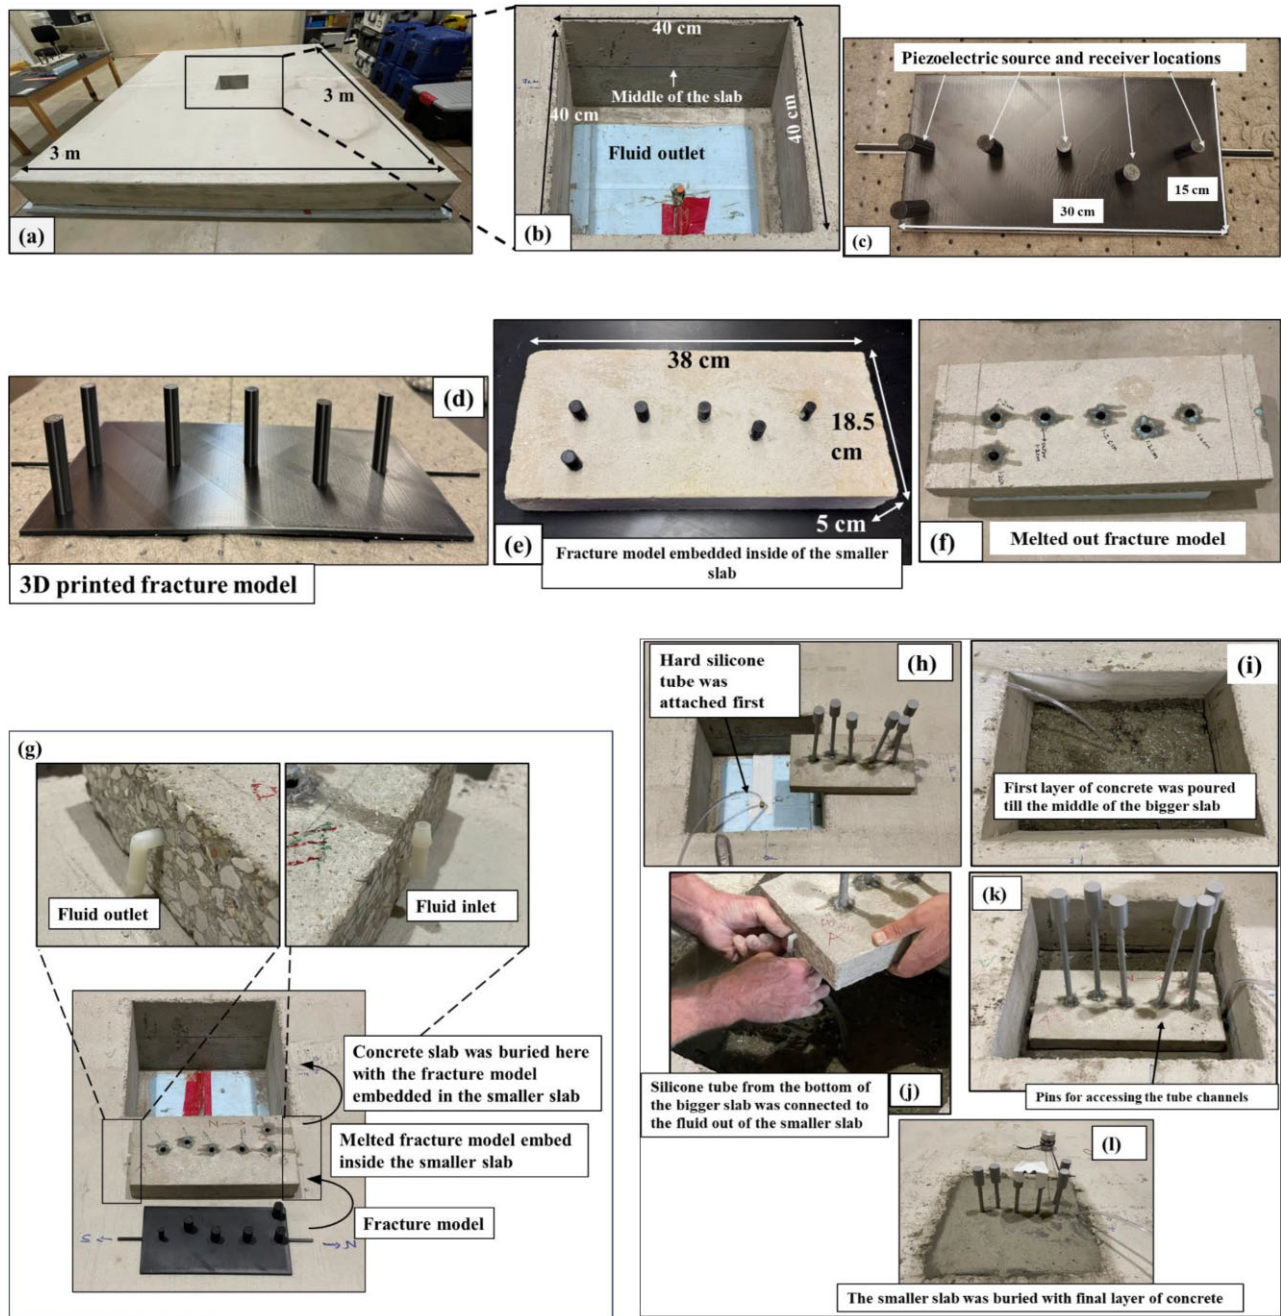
The bigger concrete slab (a) and the rectangular excavated part in the middle of it (b). The 3-D printed crack model is shown in panels (c) & (d). The embedded crack model inside the smaller slab (e) and the slab after melting out the crack model (f). Visualization of the fluid inlet and outlet with respect to the smaller slab (g). Step-by-step photos showing the attachment of the smaller concrete slab with the crack model to the bigger concrete slab. Excavated part within the larger slab, hard silicone tubes were used to attach the fluid channels inside the bigger slab with the smaller one (h). A layer of concrete was poured into the middle of the empty section (i). The smaller concrete slab was kept on top of the poured concrete after making sure that the freshly poured concrete had cured enough to avoid the problem of the smaller slab sinking (j and k). (l) 3-D printed pins were used to ensure that we had access to the void or crack after burring the crack model completely, which were removed later.
